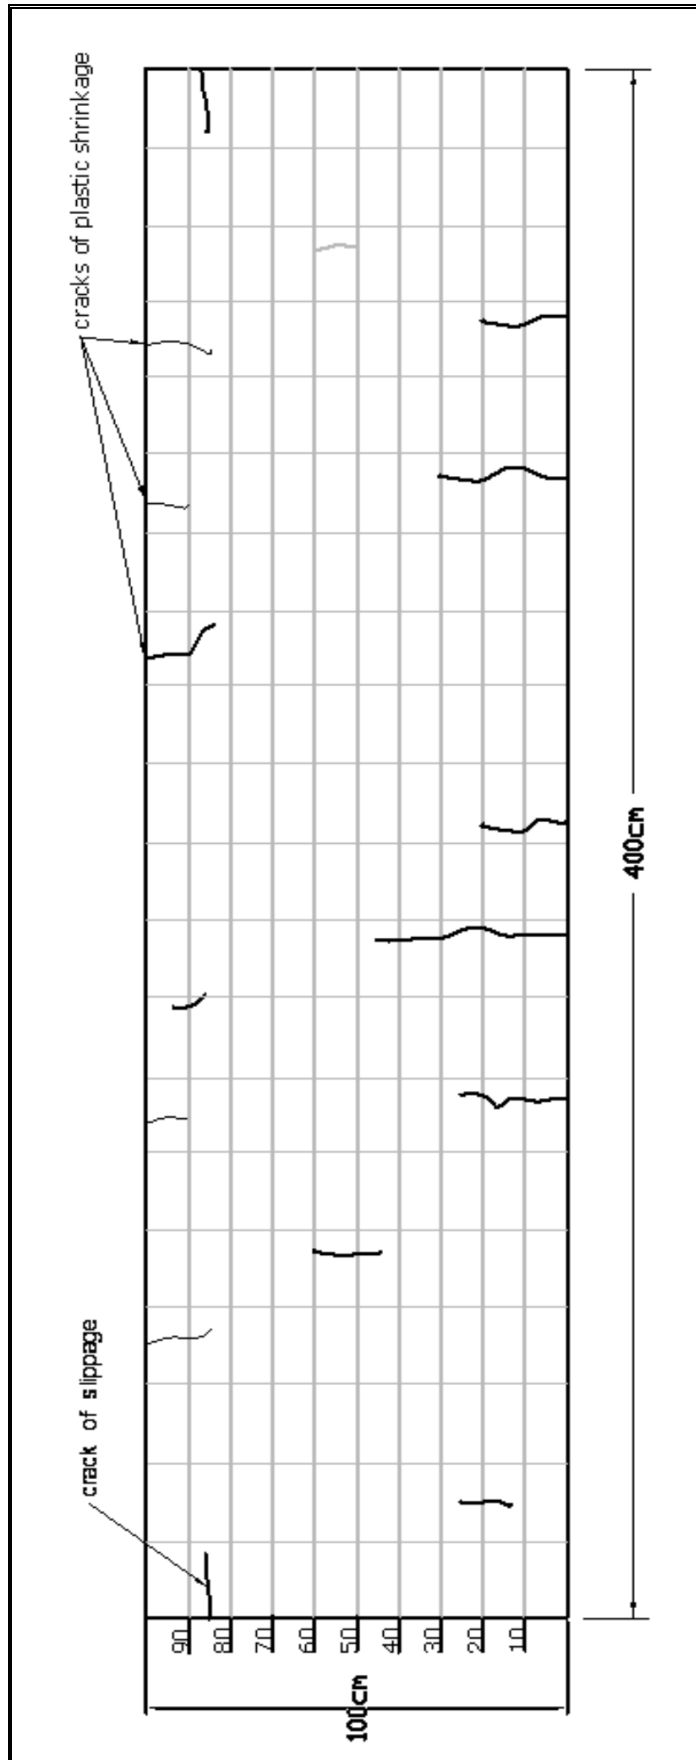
Final cracking pattern of wall (4W) after age of (90) days
